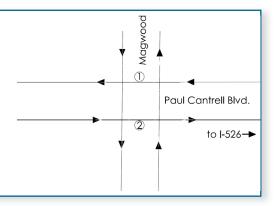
Paul Cantrell Boulevard at Magwood Drive Alternative 6
